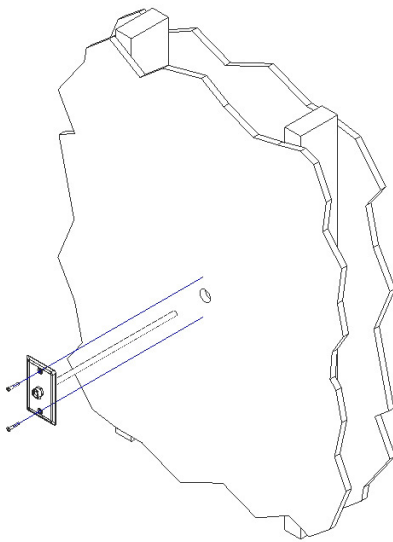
Connect tubing to Quick Disconnect Wall Plate
